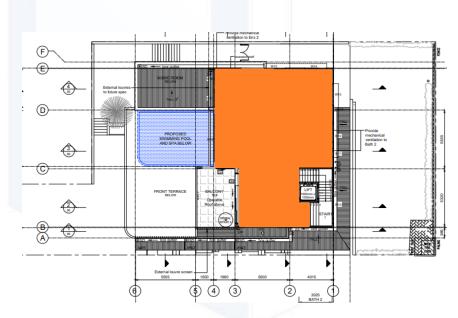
First Floor GFA (Orange) – 128 SQM (no change)
